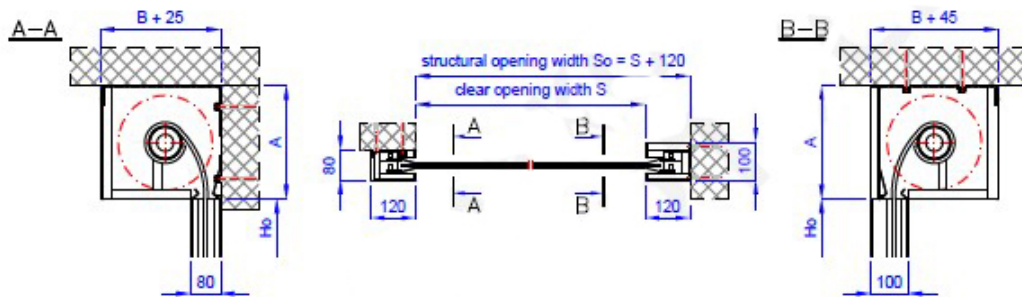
Fire protection curtain door EI120, mixed mounting
